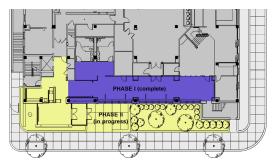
The pavilion addition and lobby renovation create a more gracious entry sequence and provides room for a full-sized security station and associated queuing area.
